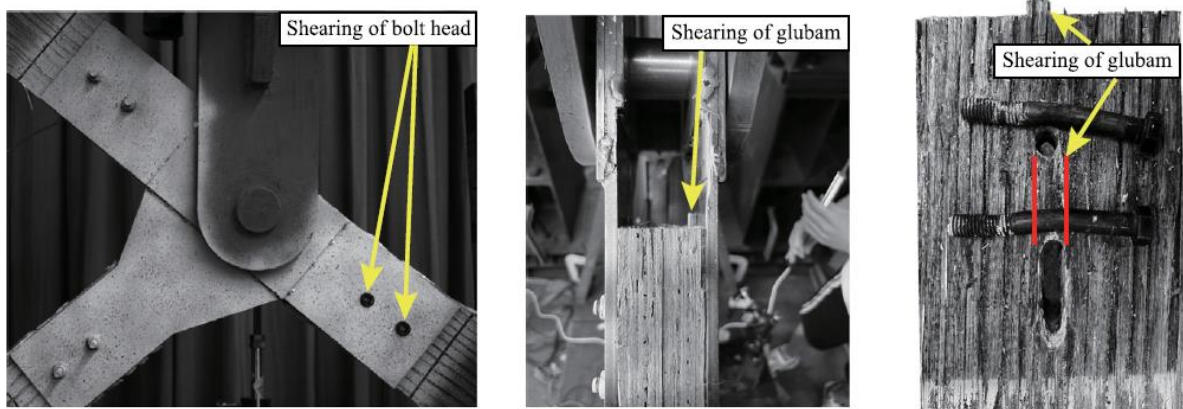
Typical Failure Modes of Steel Side-Clamped-Plate Glulam Roof Trusses under Hysteretic Loading
